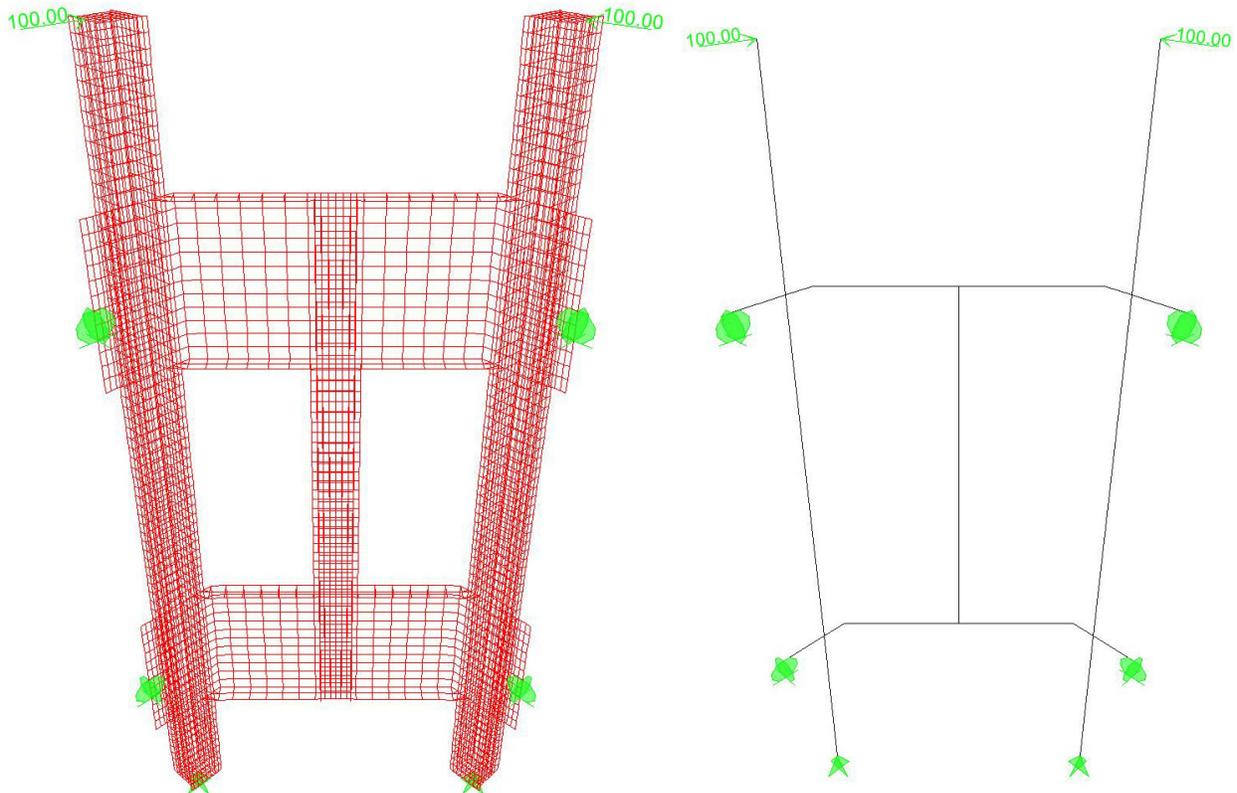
Column and spandrel rigidity of typical exterior wall corner panel.
